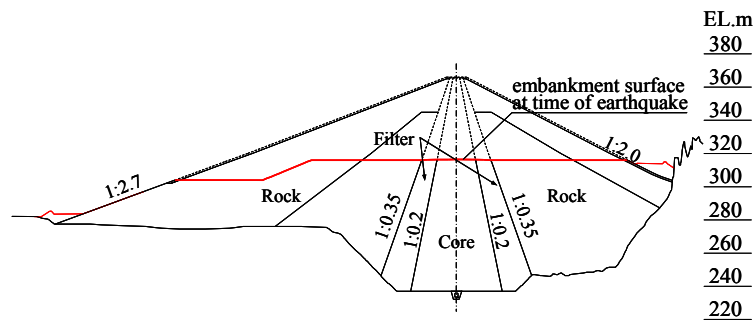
Standard cross-section of the Isawa Dam and construction elevation at the time of the earthquake
